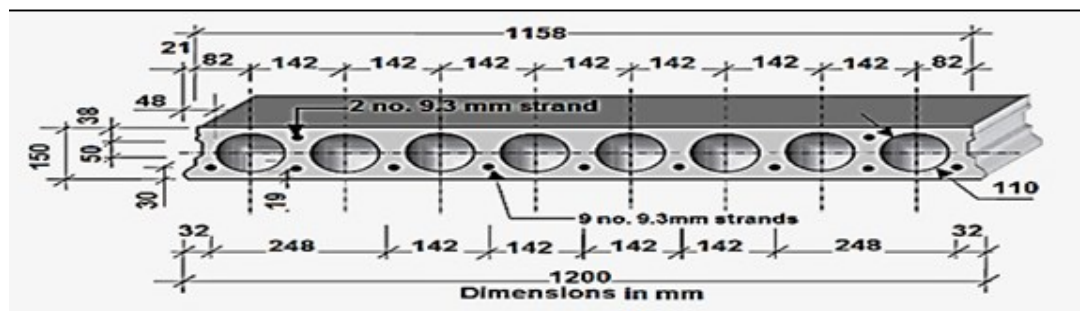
Details of the 150 mm precast-prestressed hollow core slabs adopted in the experimental investigation .
